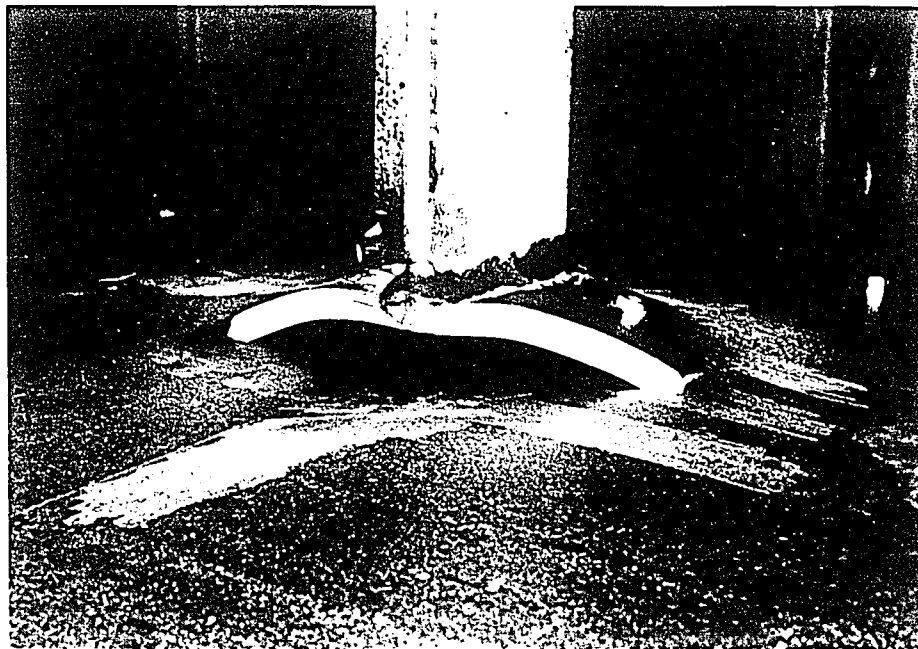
Typical crack surface of failure of Axial Alternate 3. The detail pictured was subjected to an ultimate tension load after a through-thickness crack developed.
